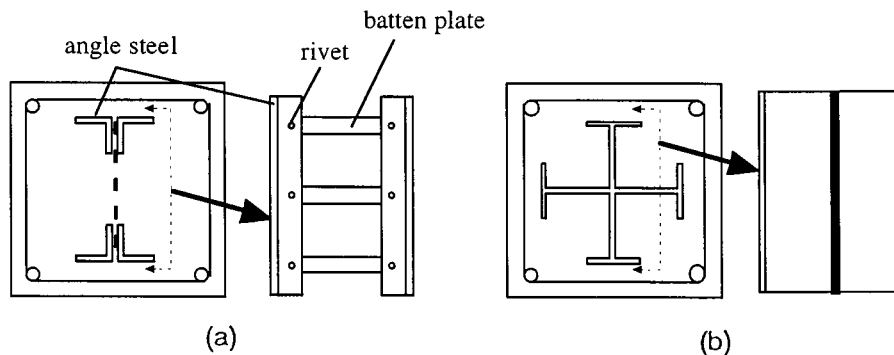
Typical SRC column sections: (a) built-up steel web forming a ladder; (b) full web steel (Buildings A, B, and C)
